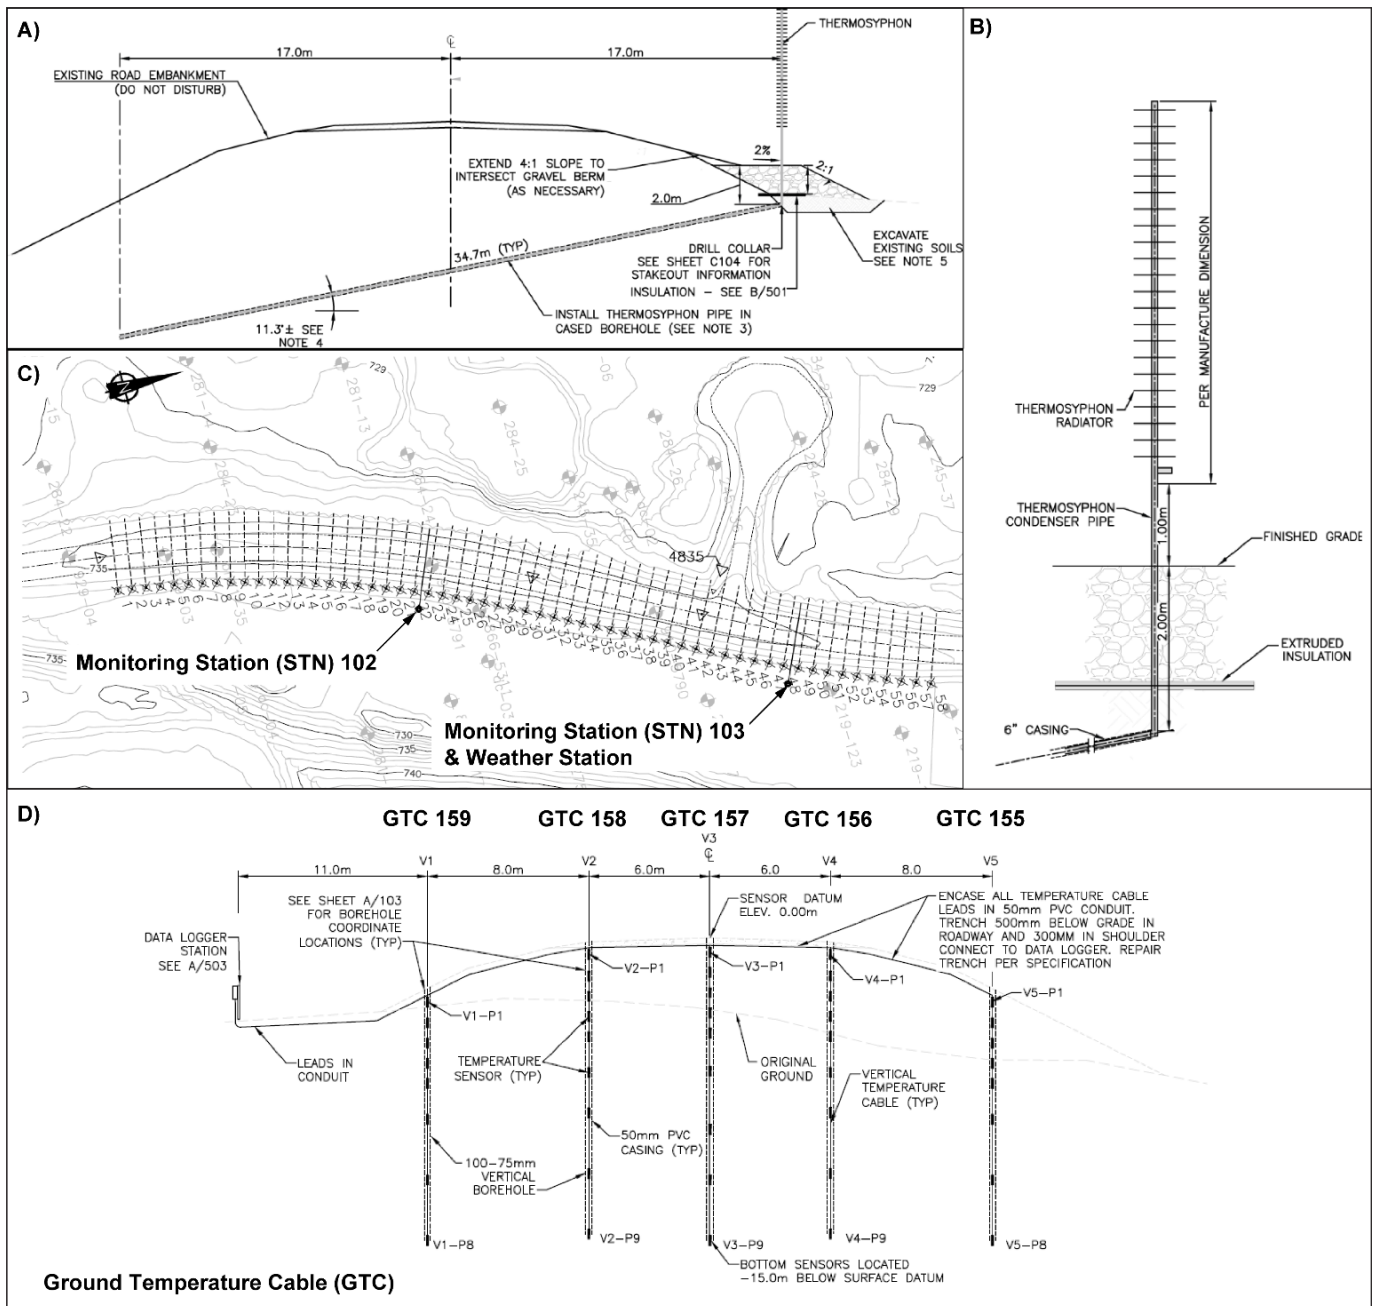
Design showing A) cross-sectional view with slope thermosyphon evaporator pipe beneath existing highway embankment, B) thermosyphon riser and radiator, C) plan view evaporator pipe layout, and D) cross-section of vertical ground temperature cables (GTCs) installed at monitoring stations STN 102. Ground temperature cable installed along inclined evaporator pipe not shown.
